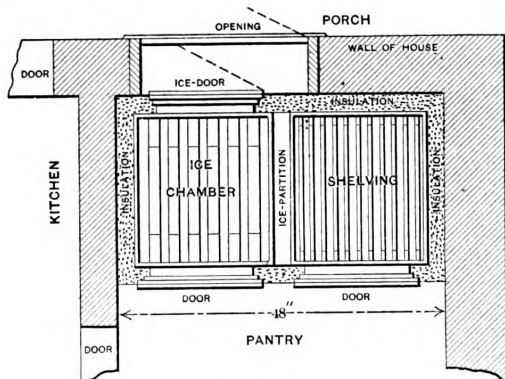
Plan Showing Position of Refrigerator in Pantry and Doors for Icing from the Outside.
